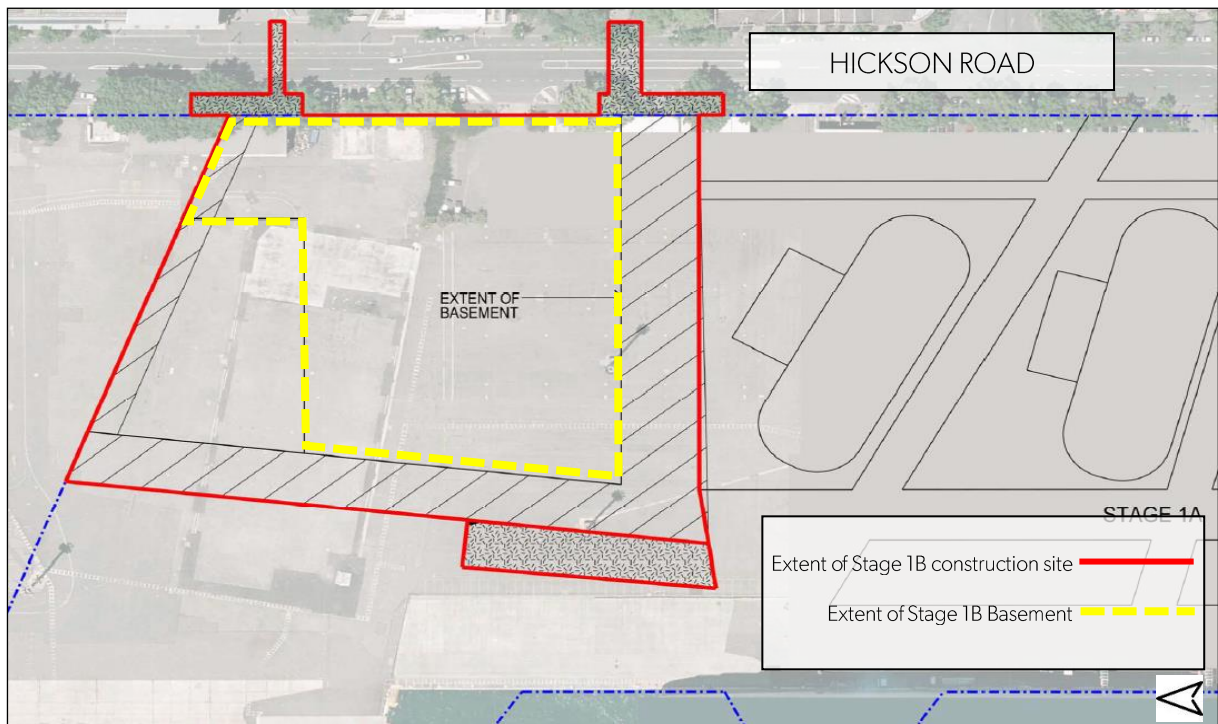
| The approved Stage 1B basement (dashed yellow line) and Stage 1B basement construction area (red line) (Source: EIS SSD 6960)
